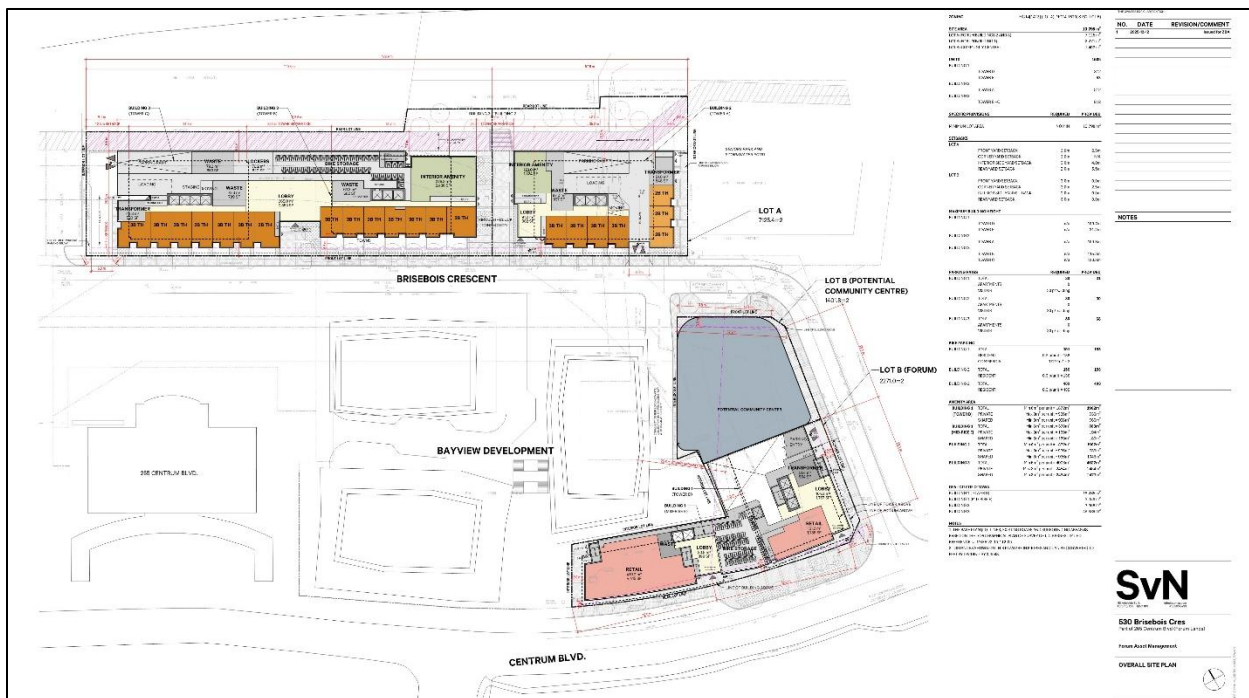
Excerpt of the Overall Site Plan REV #1 Drawing No.: 0-A101 prepared by SvN Architects + Planners dated December 12, 2025.
